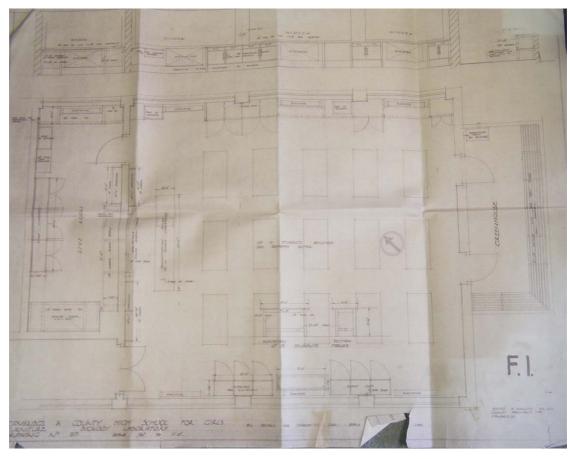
Plan Showing Design of Biology Lab (Note greenhouse which would have projected above ground floor changing rooms) (W.H.Wingage)
